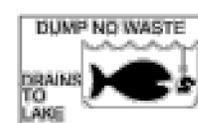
PLATE SHALL BE ADDED TO STORMWATER SIGNS AS REQUIRED BY THE CITY.
